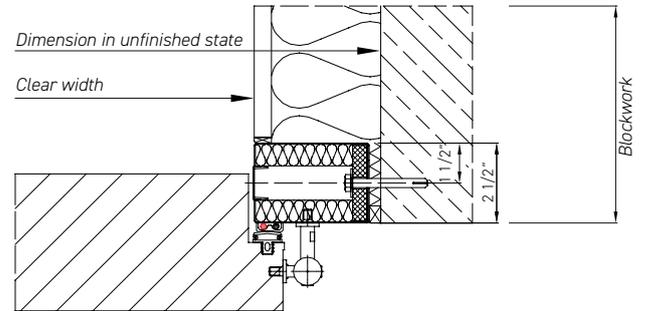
Block / Block frame with pocket holes in the reveal area
